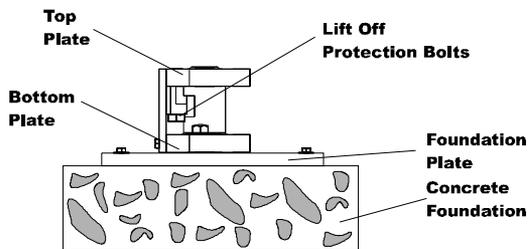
INSTALLATION OF LOAD POINT ASSEMBLY ON FOUNDATION PLATE
